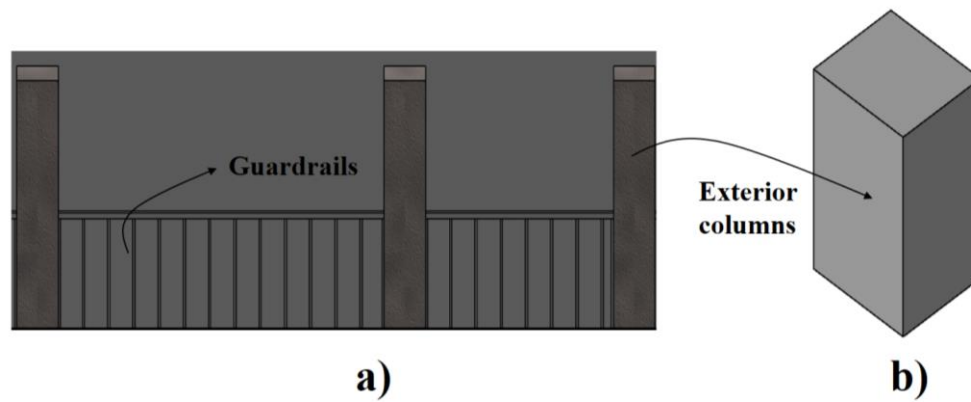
(a) Guardrail placed at the slab edges, and (b) exterior column component used for placing the guardrails at the slab edges
